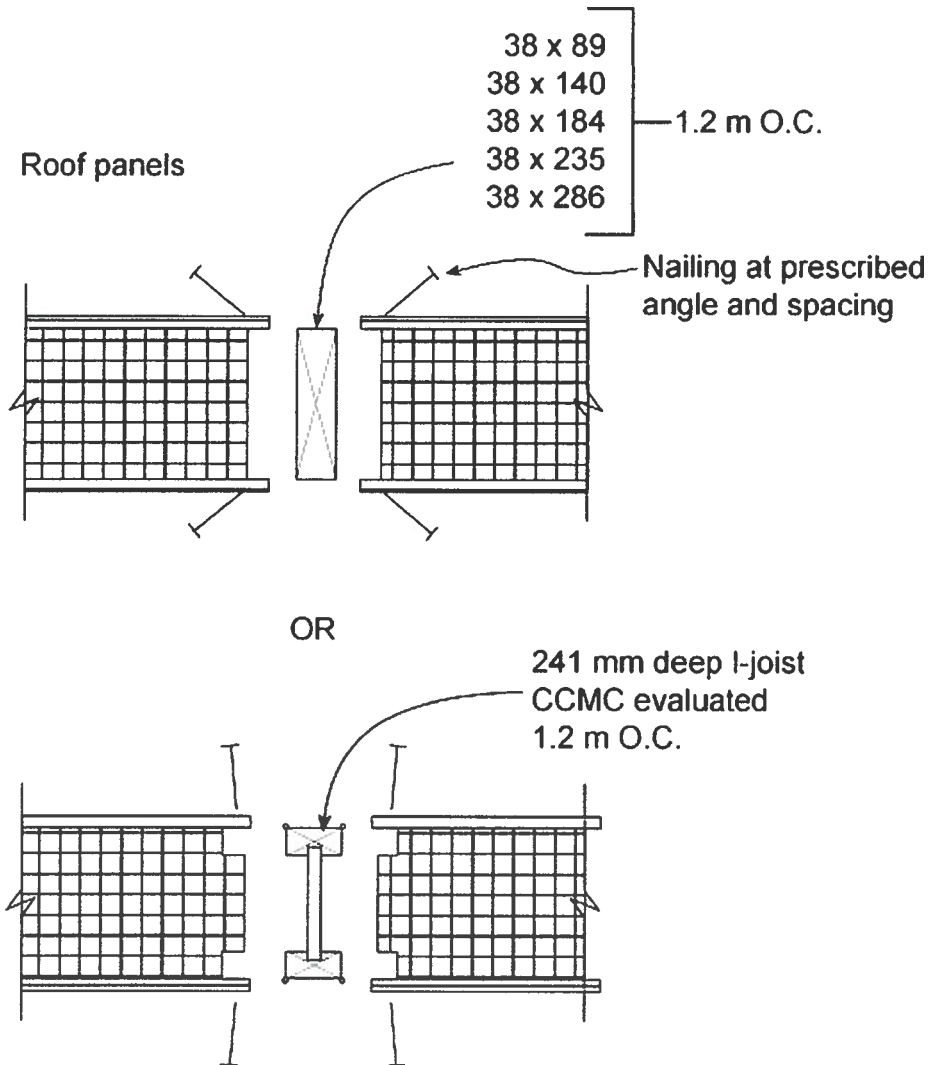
"Insulspan SIP System" – structural roof panels with lumber or prefabricated I-joists at 1.2 m o.c. See manufacturer's details for sealant and tape requirements
